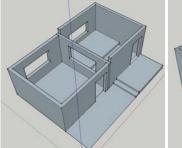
Two rooms connected through an open window and a corridor. Corridor and right room consist of a step in each.
